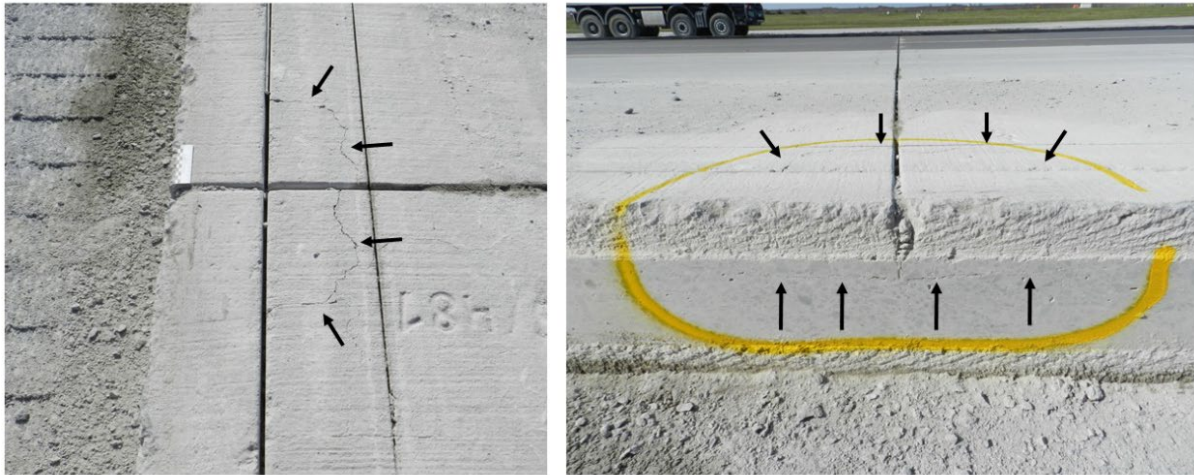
Corner cracks (black arrow) on the surface of pavement slabs (left) with the corresponding interior crack (black arrow) of the slab (right)
